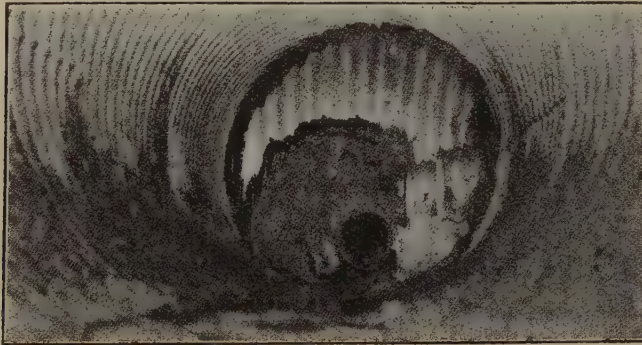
Looking west in the 36-inch collector line toward pit No. 1, showing the outfall ends of the three 8-inch perforated drain lines.
